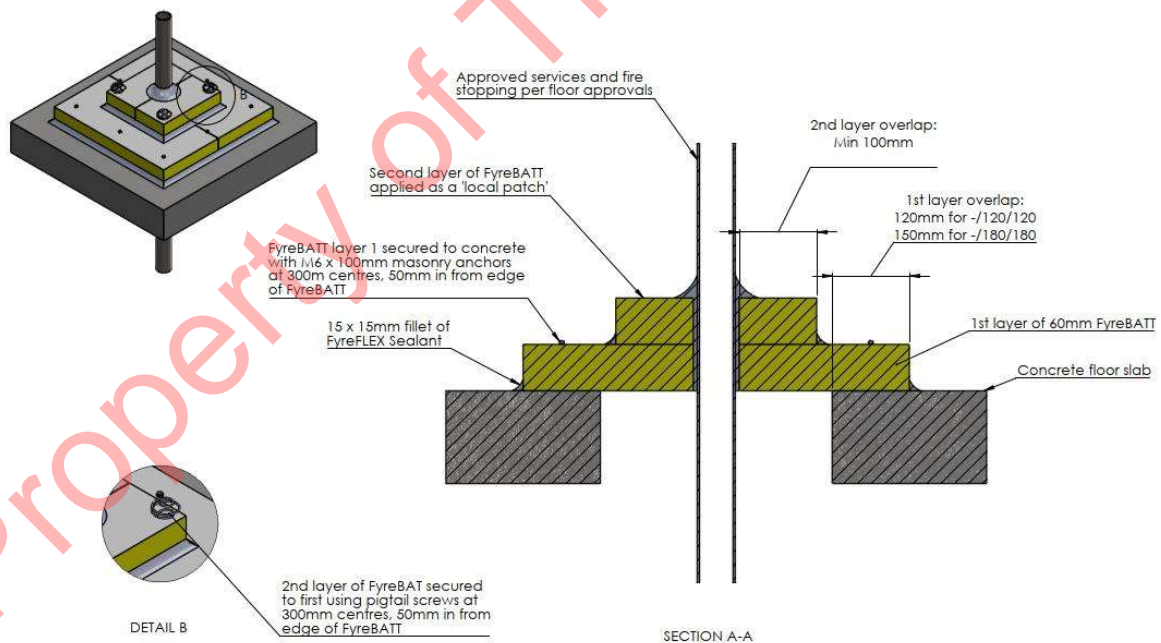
Surface mounted single layer FyreBATT with local patching. Maximum size of the local patch must not exceed 400 mm x 400 mm.
